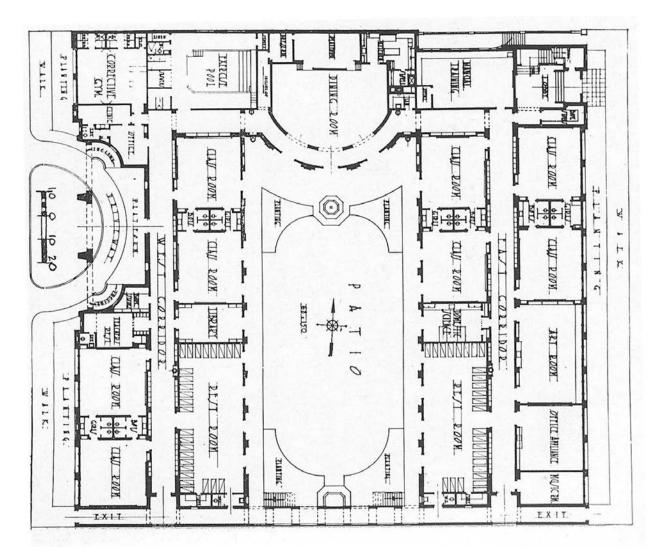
First floor plan of the former Sunshine School; north is up. Source: Public Buildings: Architecture under the Public Works Administration, 1933 to 1939
